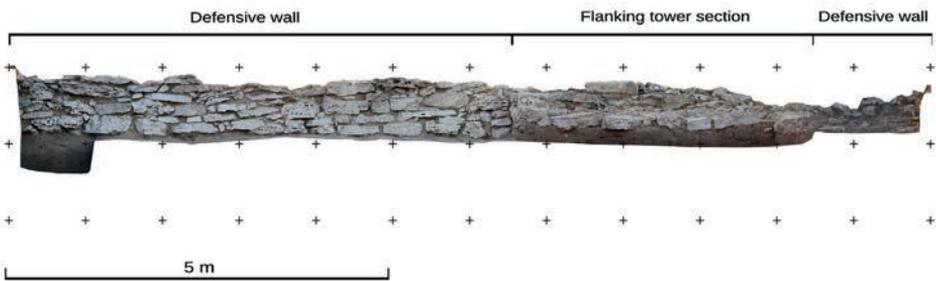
Orthophotography of western facade of defensive wall and flanking tower with different levels of foundations. Photo: P. Lech.
